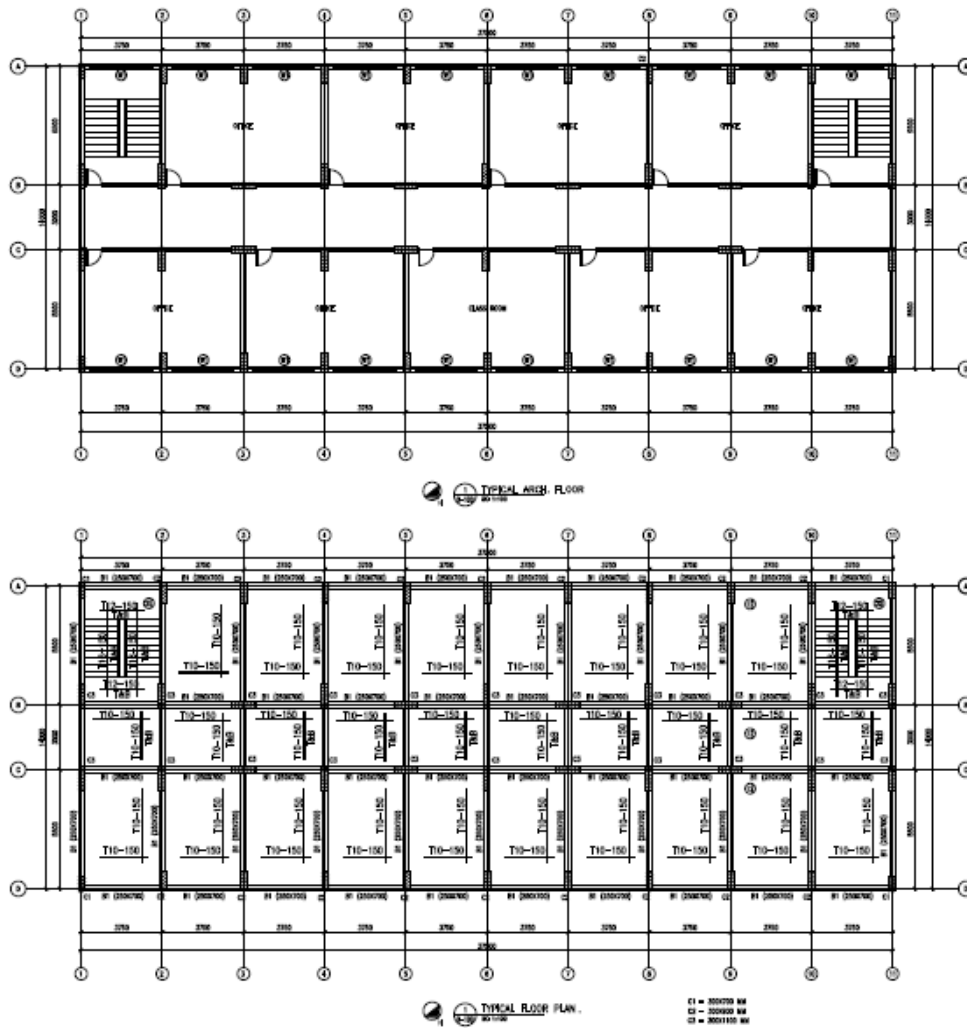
Architectural and Structural plan of case study, (Directorate of Security of Daqahlia).
